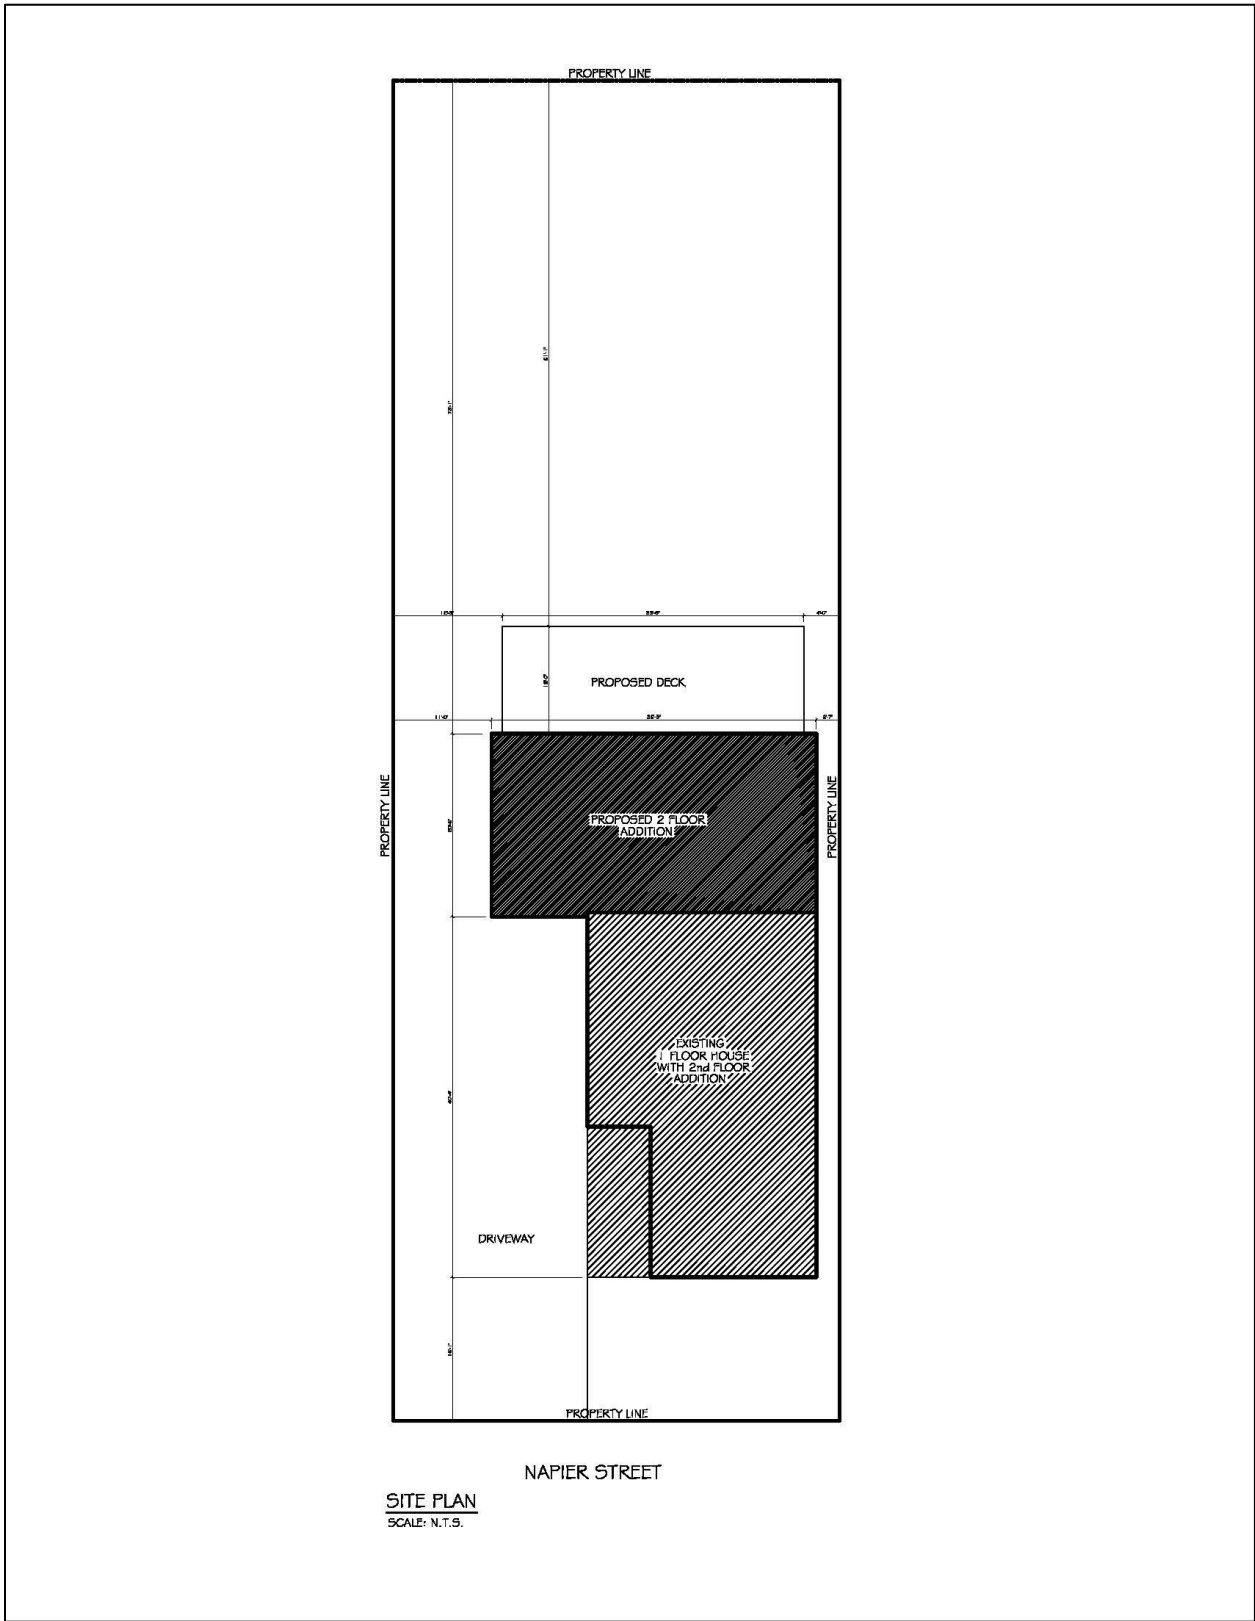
Site Plan, showing the existing house at 10 Napier Street and the proposed rear and upper storey additions.
